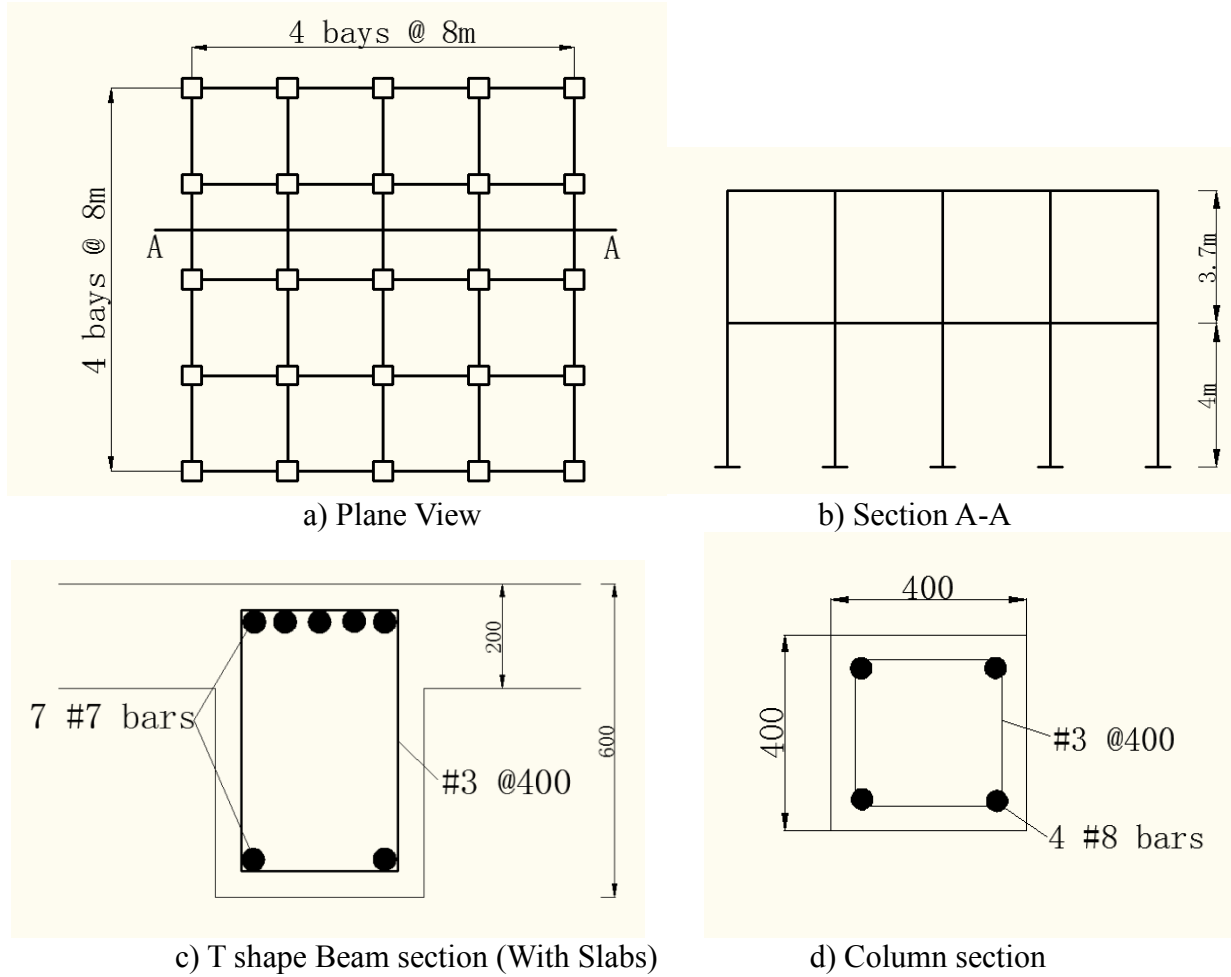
Details of Example Structure Designed with Gravity Load Only
